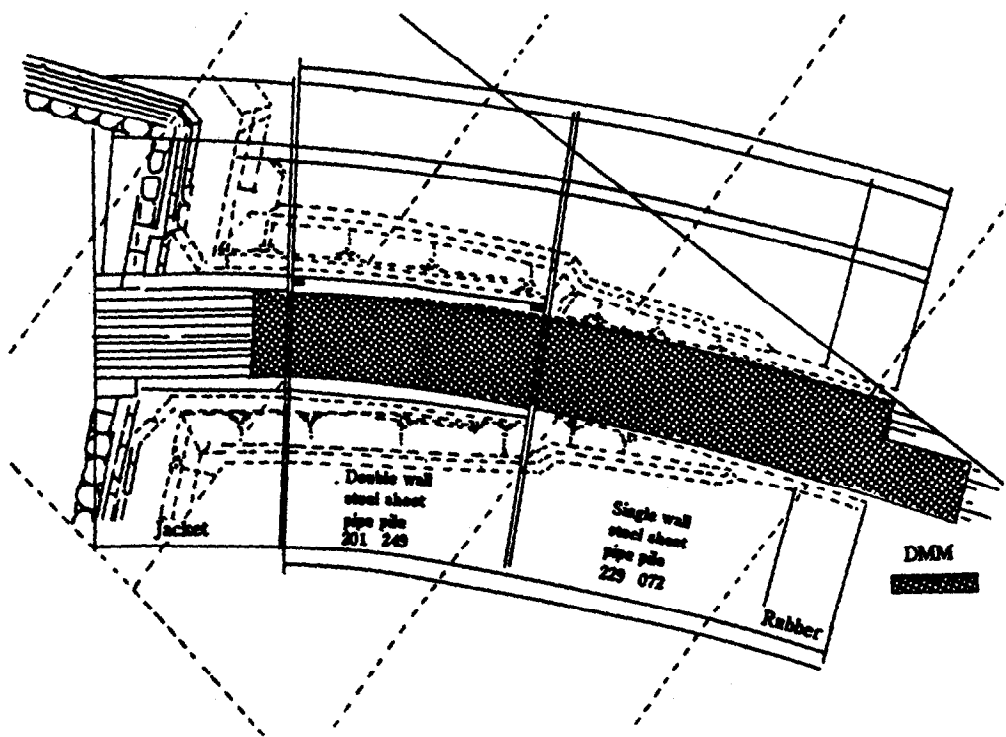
Plan of DMM work, Trans-Tokyo Bay Tunnel (Unami et al., 1996).
